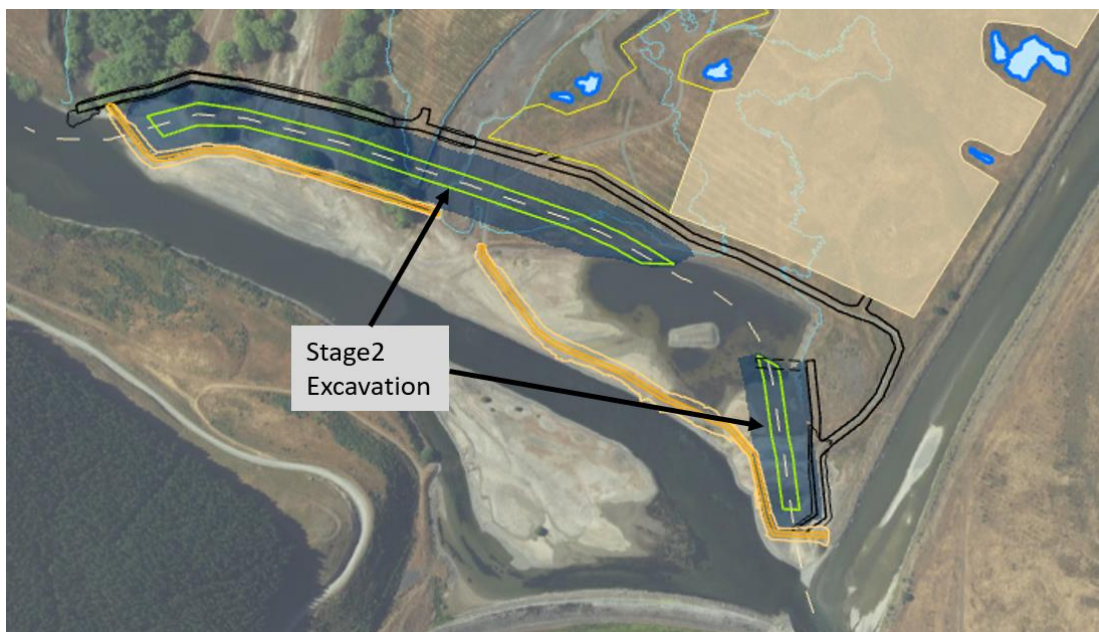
Location of Stage 2 Excavation, with channel base at RL 172 m in green outline.
